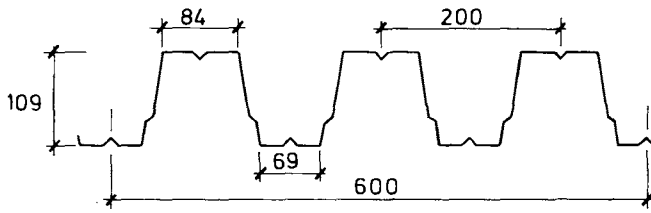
TRAPEZOIDAL COLD-ROLLED STEEL SHEET WITH INTERMEDIATE FLANGE AND WEB CORRUGATIONS. (PLANNJA TRP 110, Norrbottens Järnverk AB, Luleå, Sweden)
